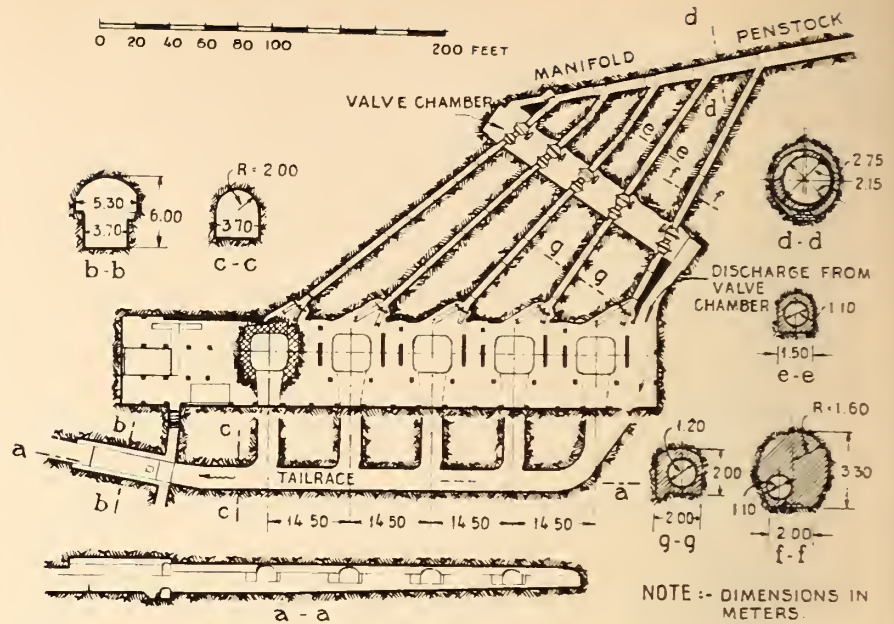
General Plan of Innertkirchen Underground Power Plant.
